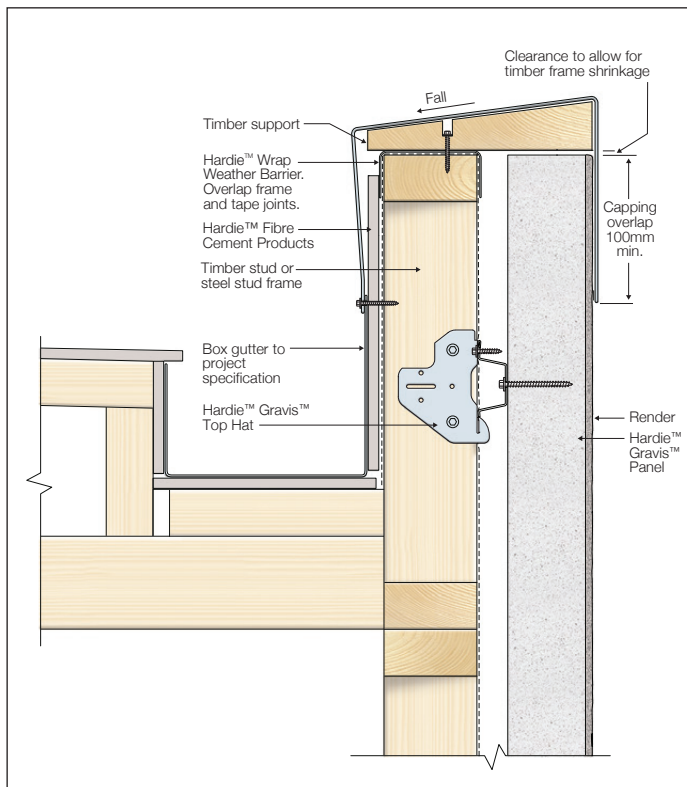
ZERO LOT WALL ROOF EAVE DETAIL
